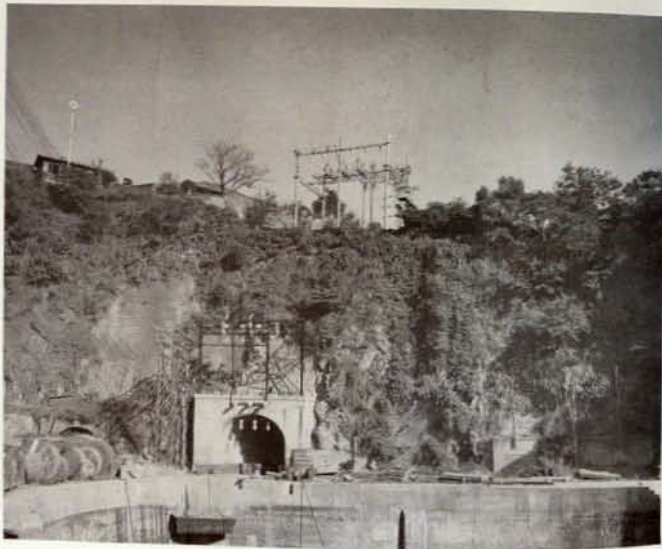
12,500 feet from GZ. Racks and circuit entrance to Mukoshima underground substation.
